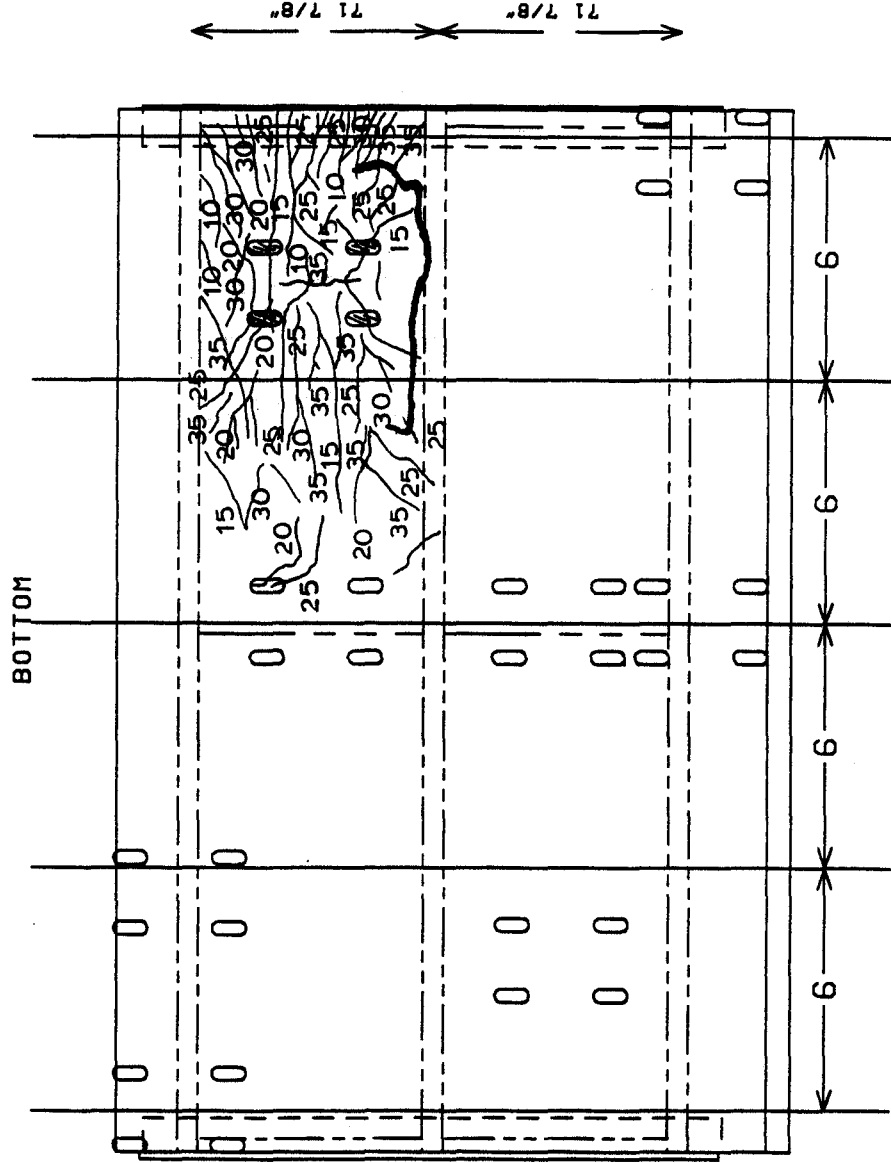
Bottom Cracking Pattern (Third Bridge - Test No. 5)
